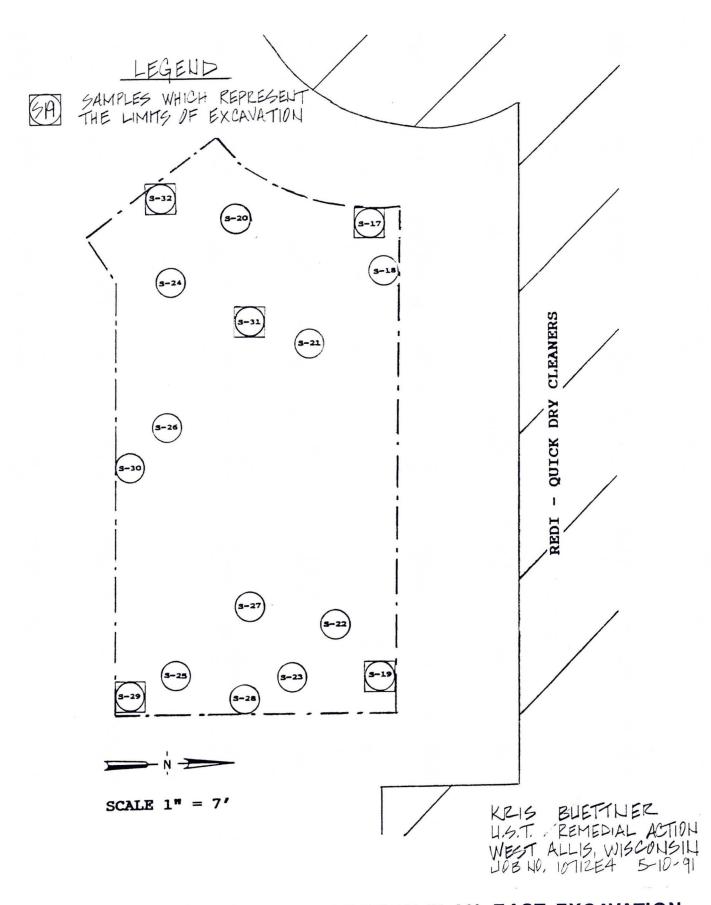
SOIL SAMPLE LOCATION PLAN-EAST EXCAVATION
